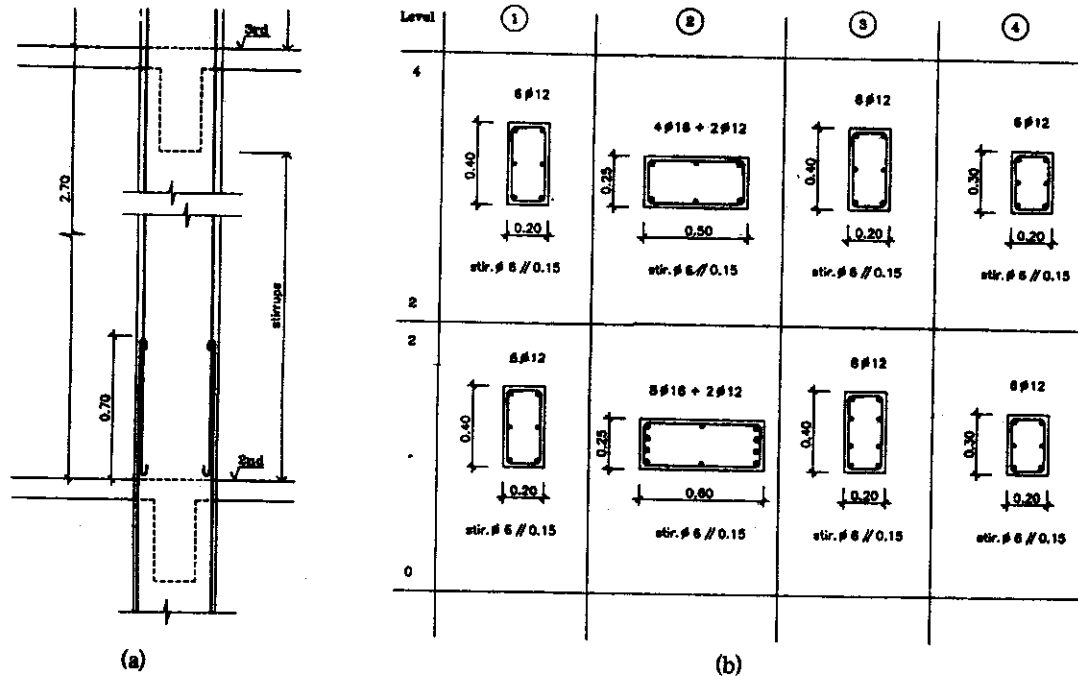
Column reinforcement: (a) lap-splicing detail (b) cross-section characteristics
